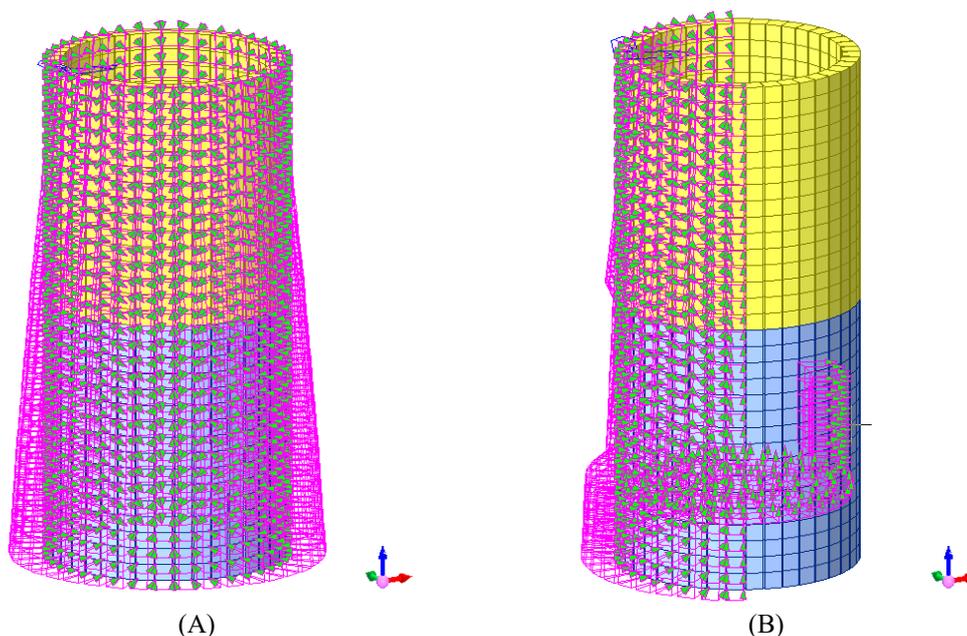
The side support point at the shaft work wall: (A) Sinking reinforced concrete shaft work process, and (B) Drilling tunnel process.
